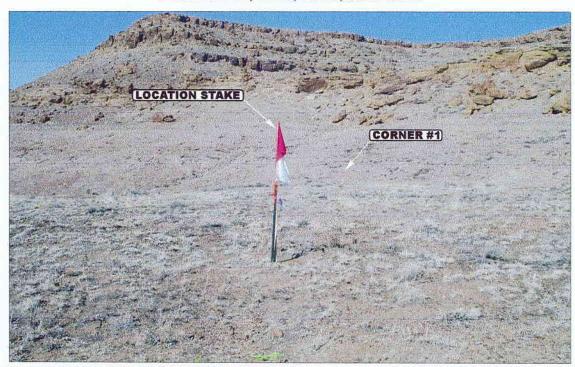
PHOTO: VIEW FROM LOCATION STAKE TO CORNER #1
